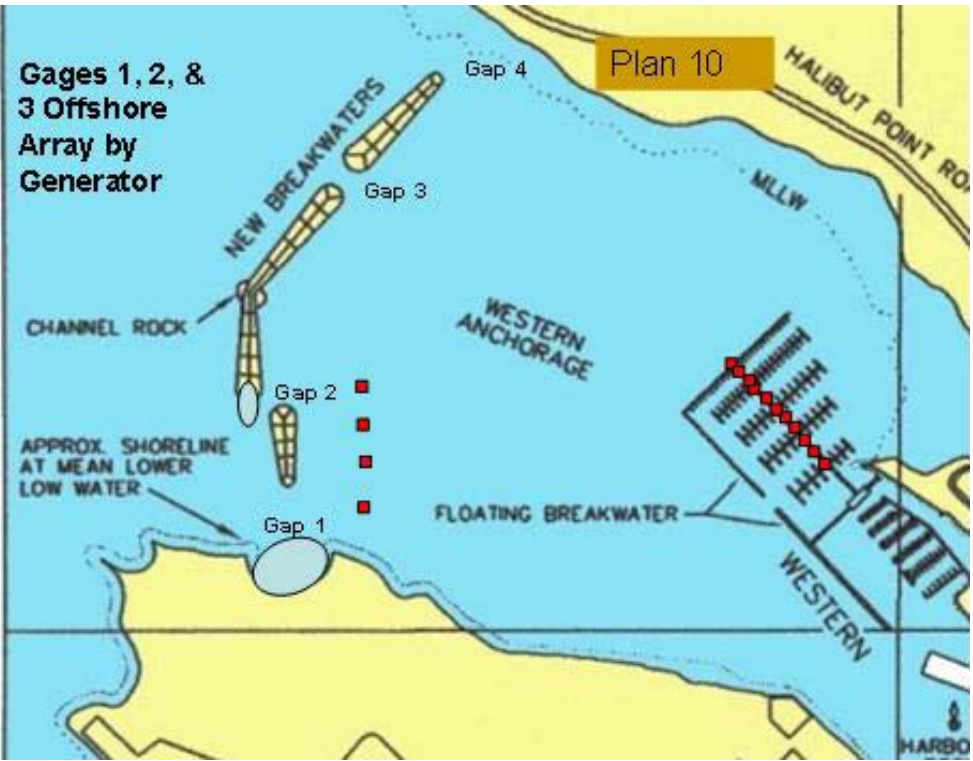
Plan 10 is a combination of Plan 3 and Plan 17.
